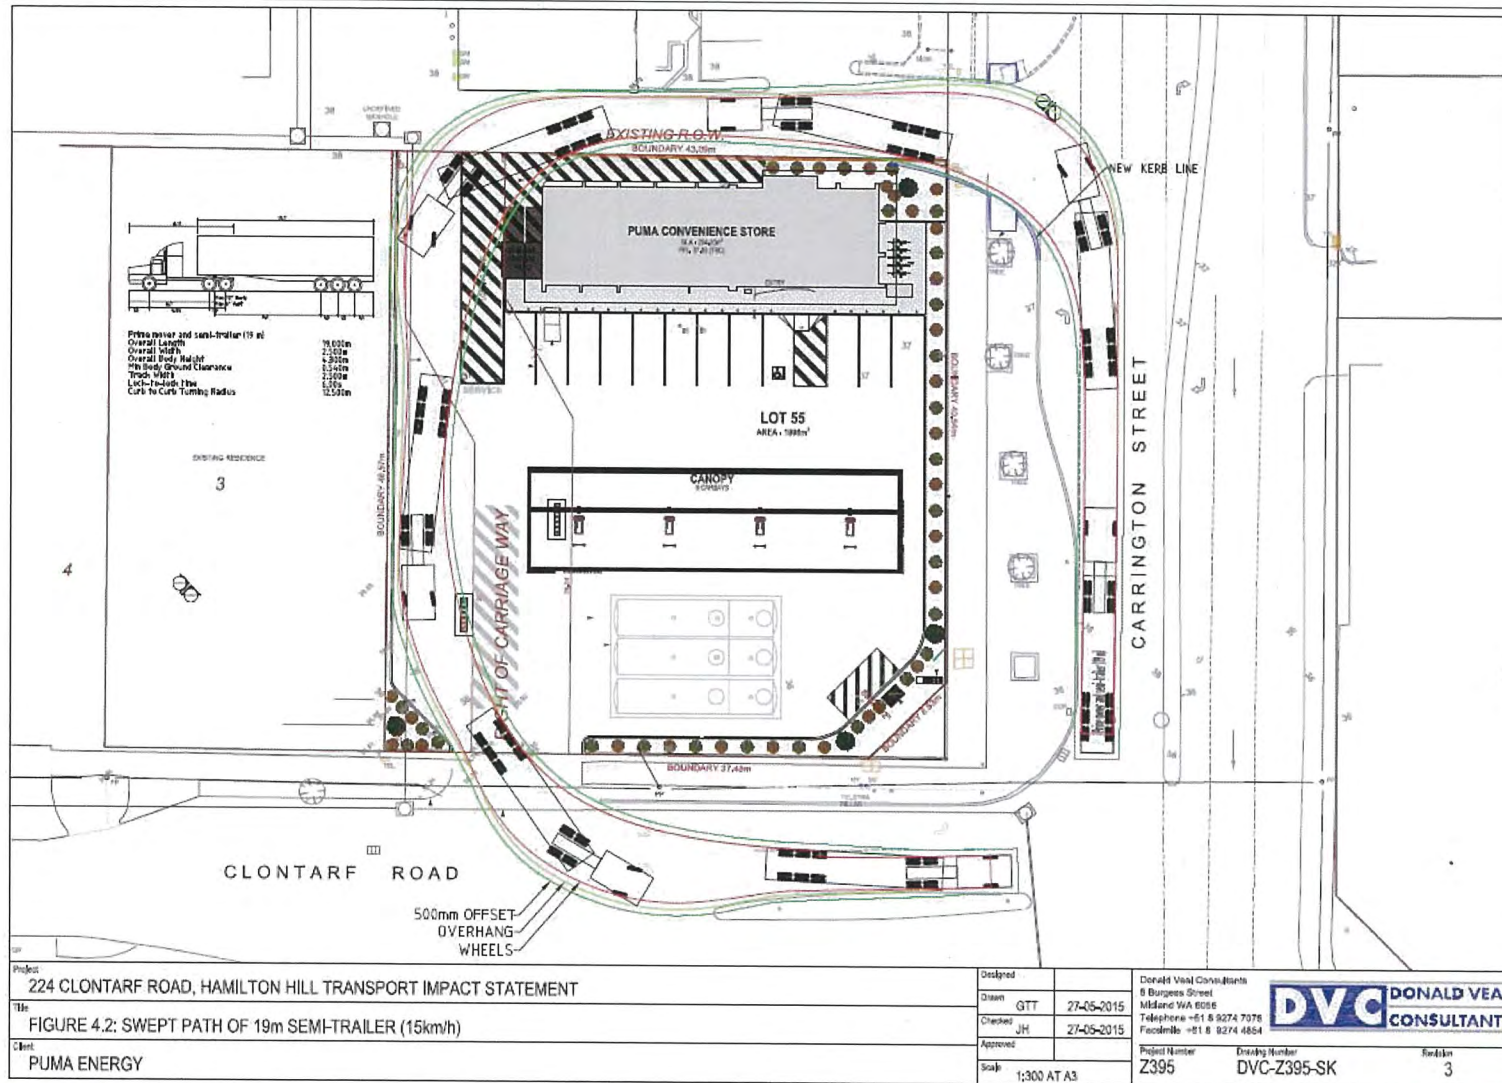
Swept path of refuelling vehicle entering Carrington Street and exiting Clontarf Road
